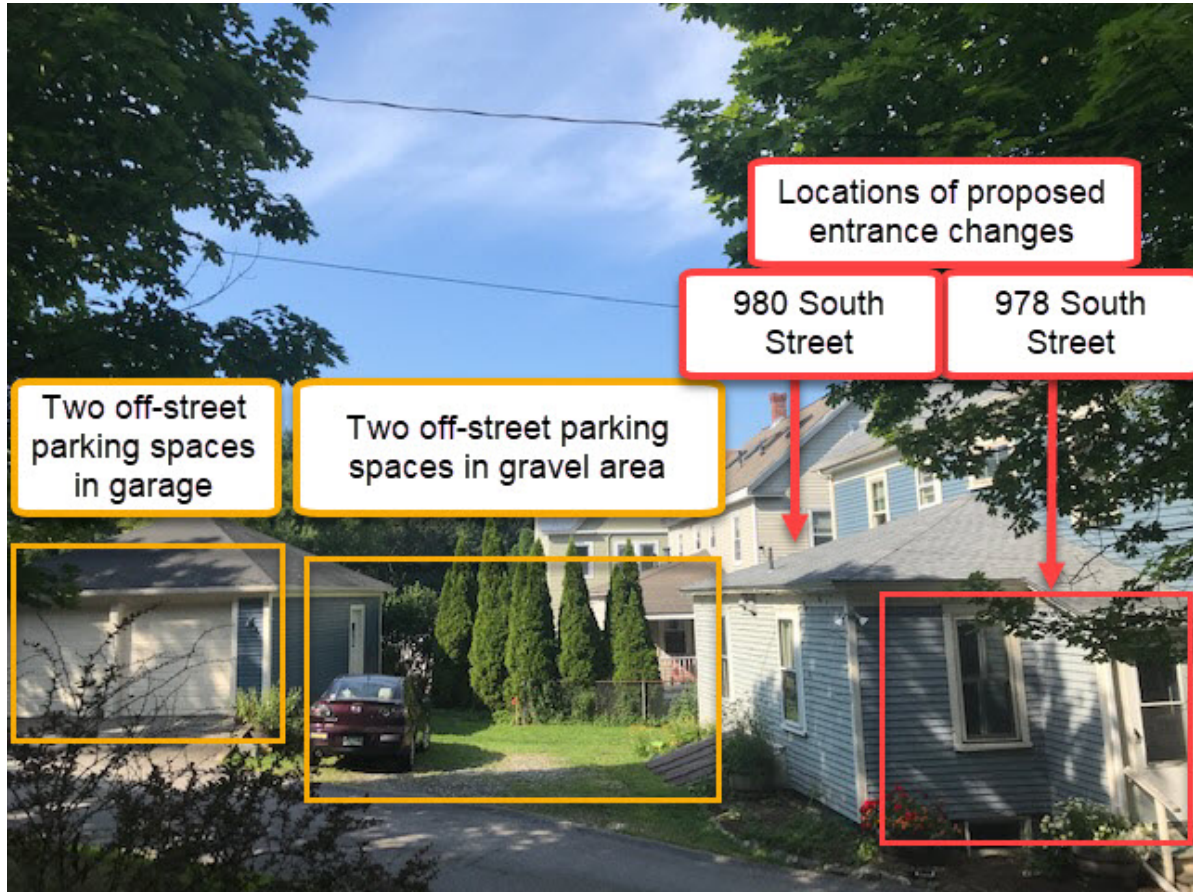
Location of existing off-street parking in relation to proposed entrance changes. Parking would not be impacted by proposed changes. Photo taken from across Rand Court from yard of 928 South Street.
